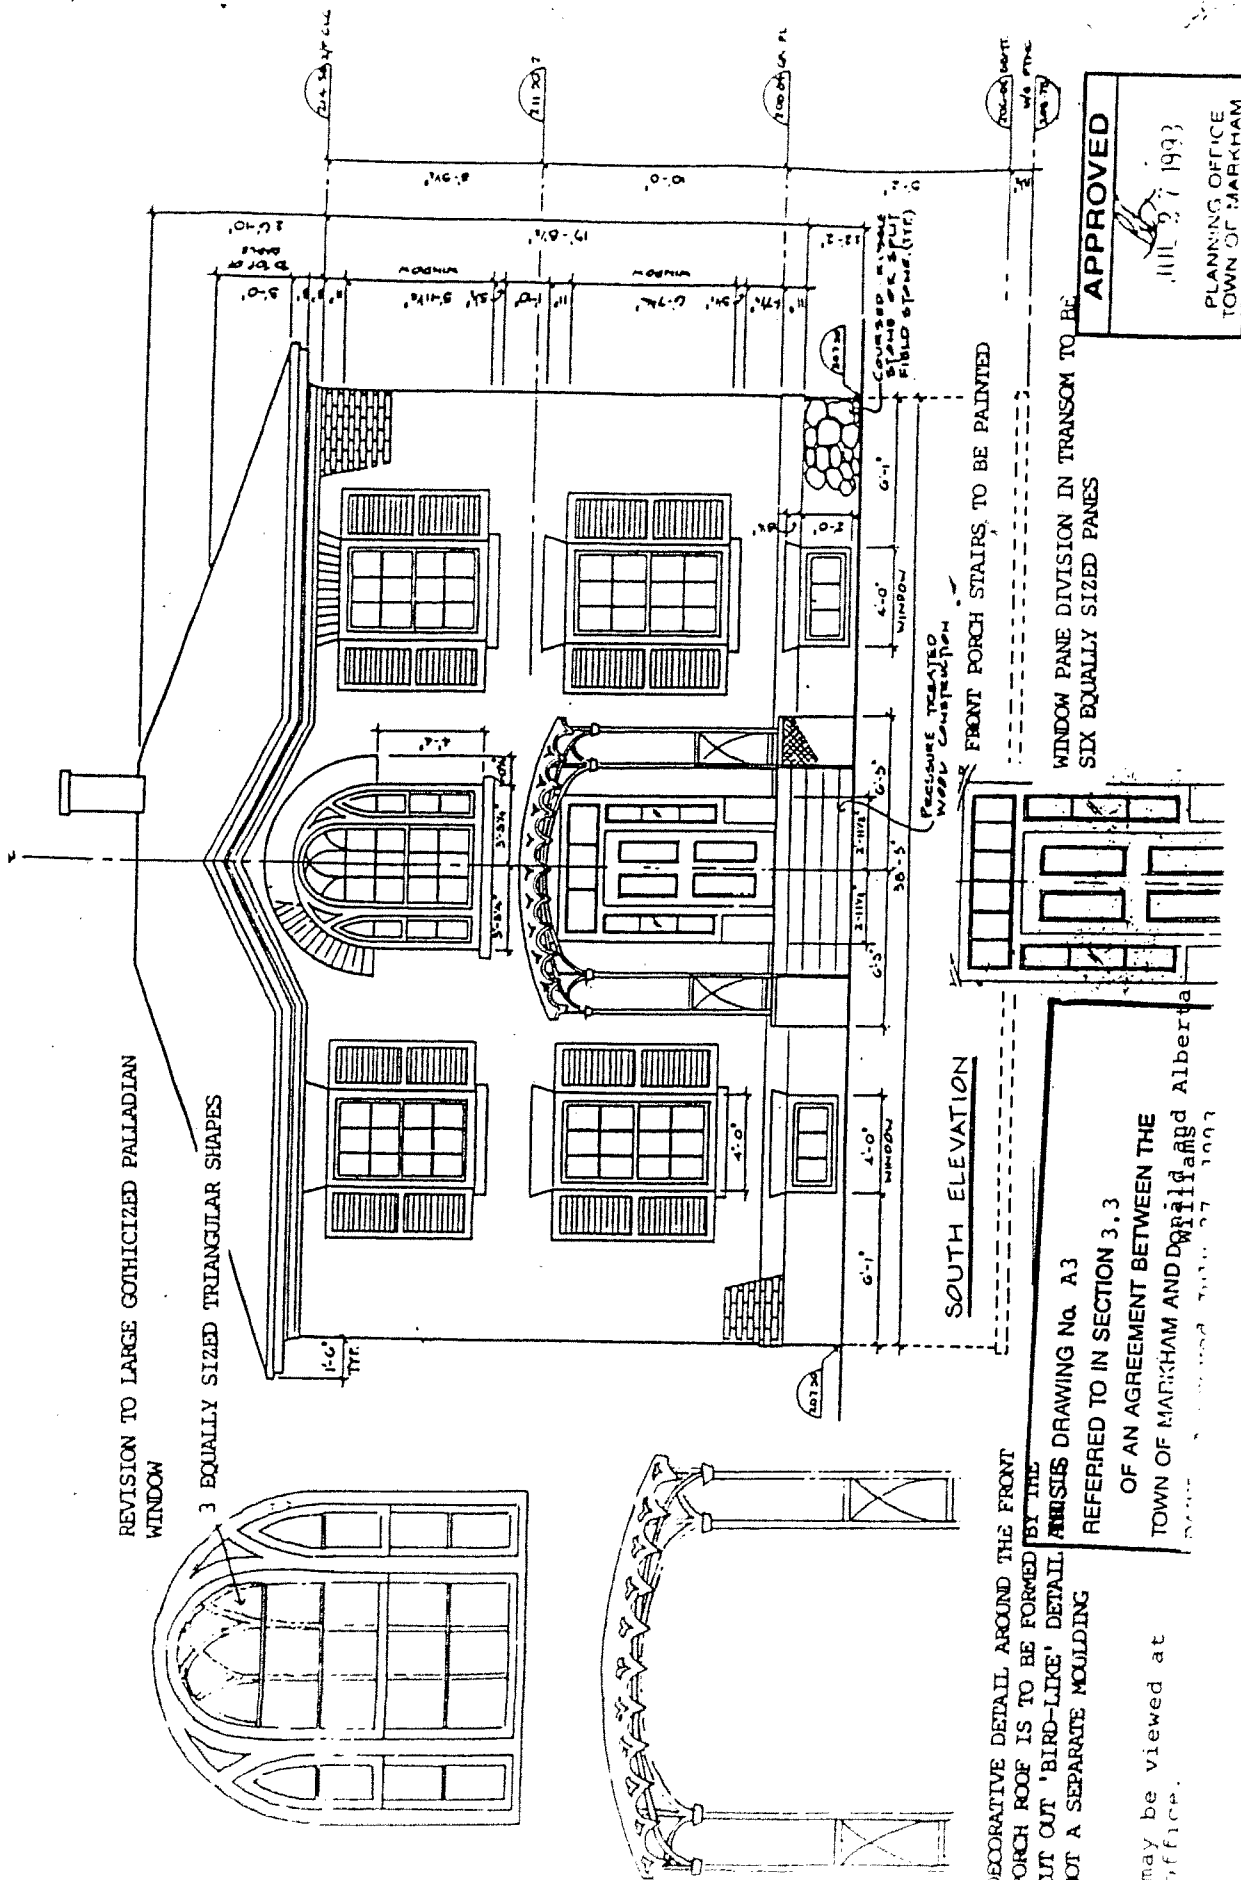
Approved Front Elevation (Original Site Plan Approval, 1993)
